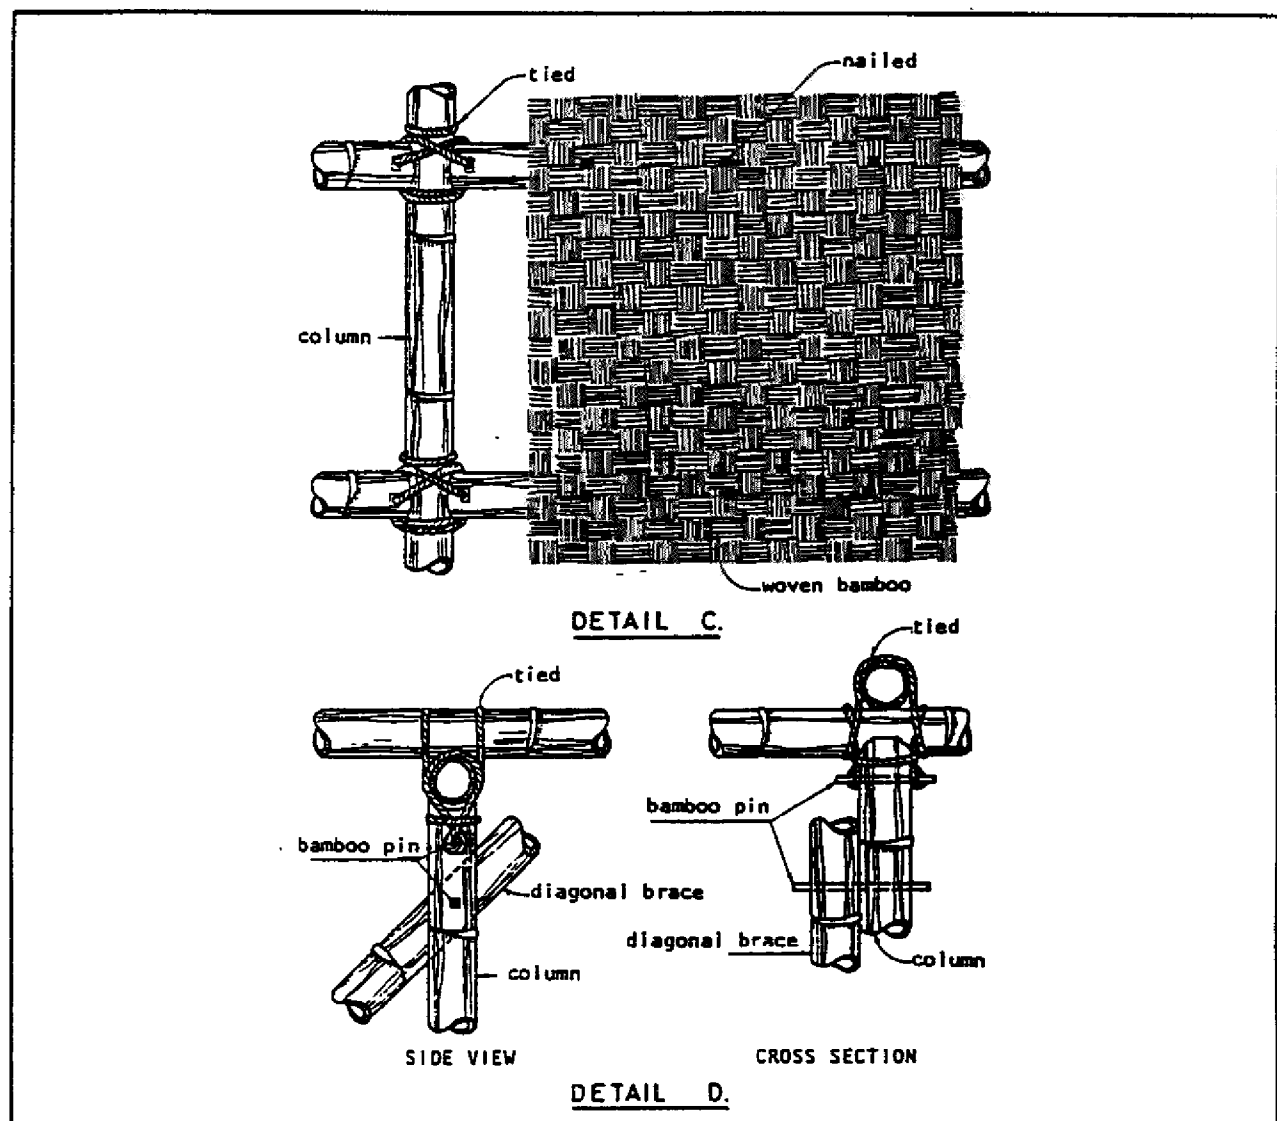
Detail Bamboo Construction with Woven Bamboo [4].
